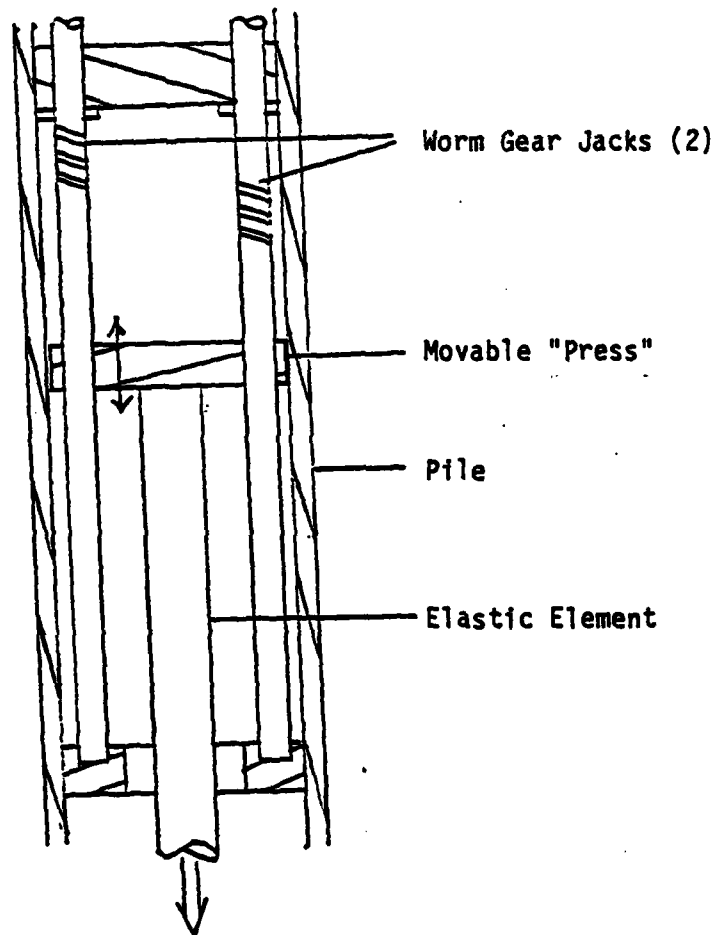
Worm gear jack for prestressing an elastic spring element.
